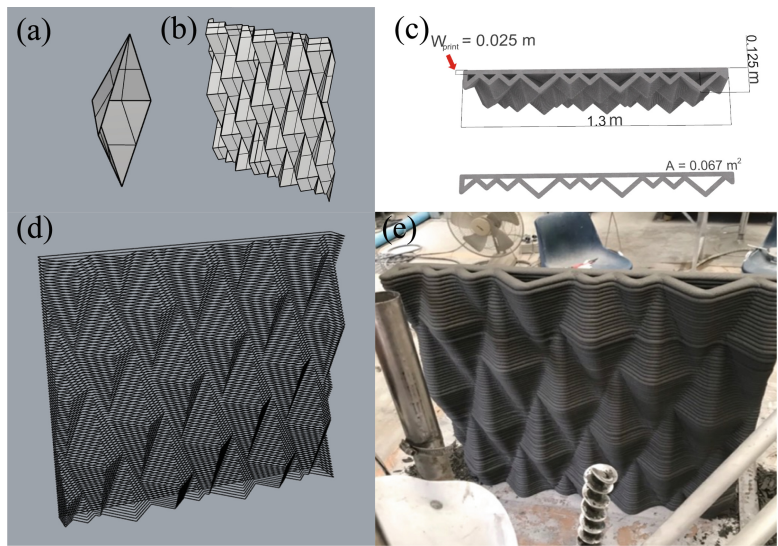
(a) Module of outer panel surface; (b) outer panel surface; (c) fabrication of inner and outer surfaces; (d) layerwise file of panel; and (e) extruded 3DP panel.
